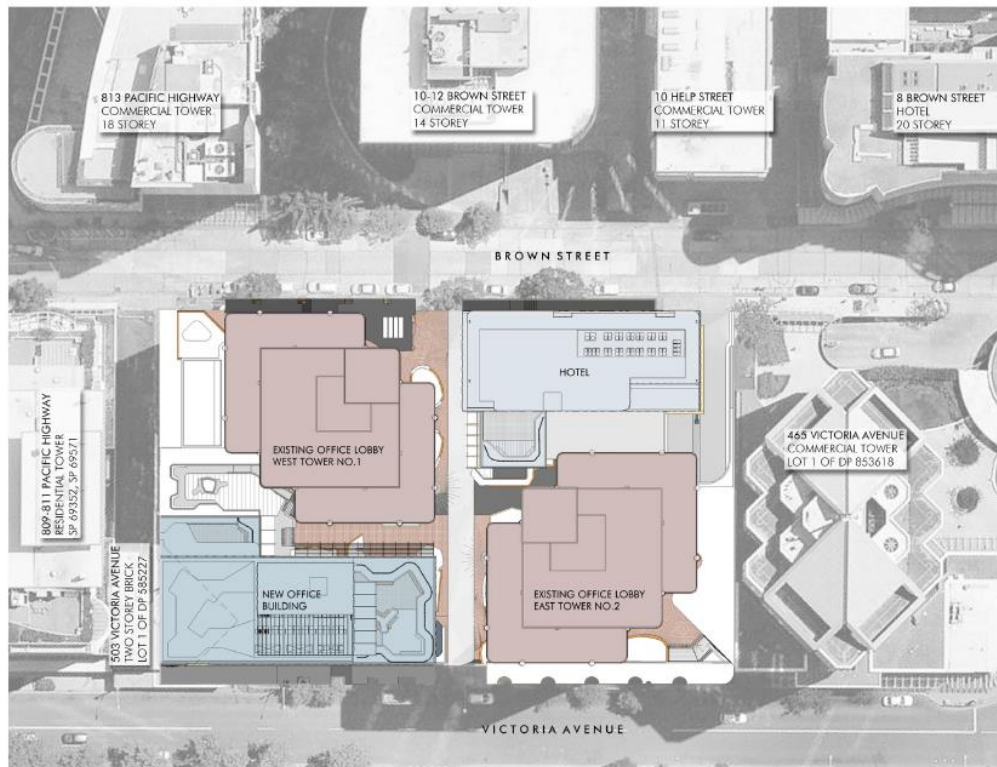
Site Plan in context of surrounding developments (Source: Nettleton Tribe)
